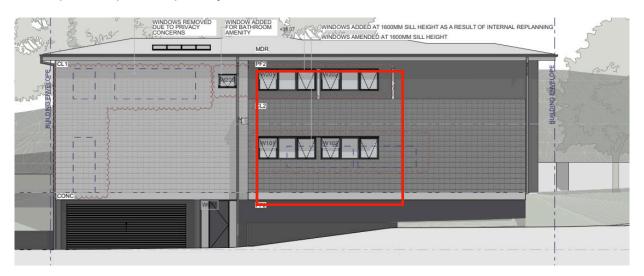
(above): Windows on northern facade overlooking 23 & 25 Cherry Lane.
